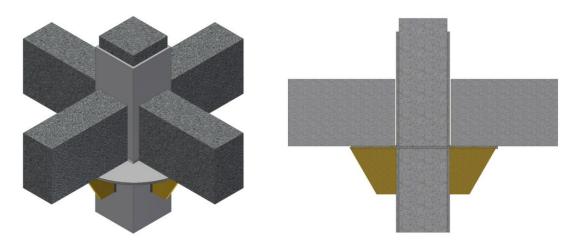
Simple connection between concrete beam and concrete filled steel tubular column with supporting corbel
